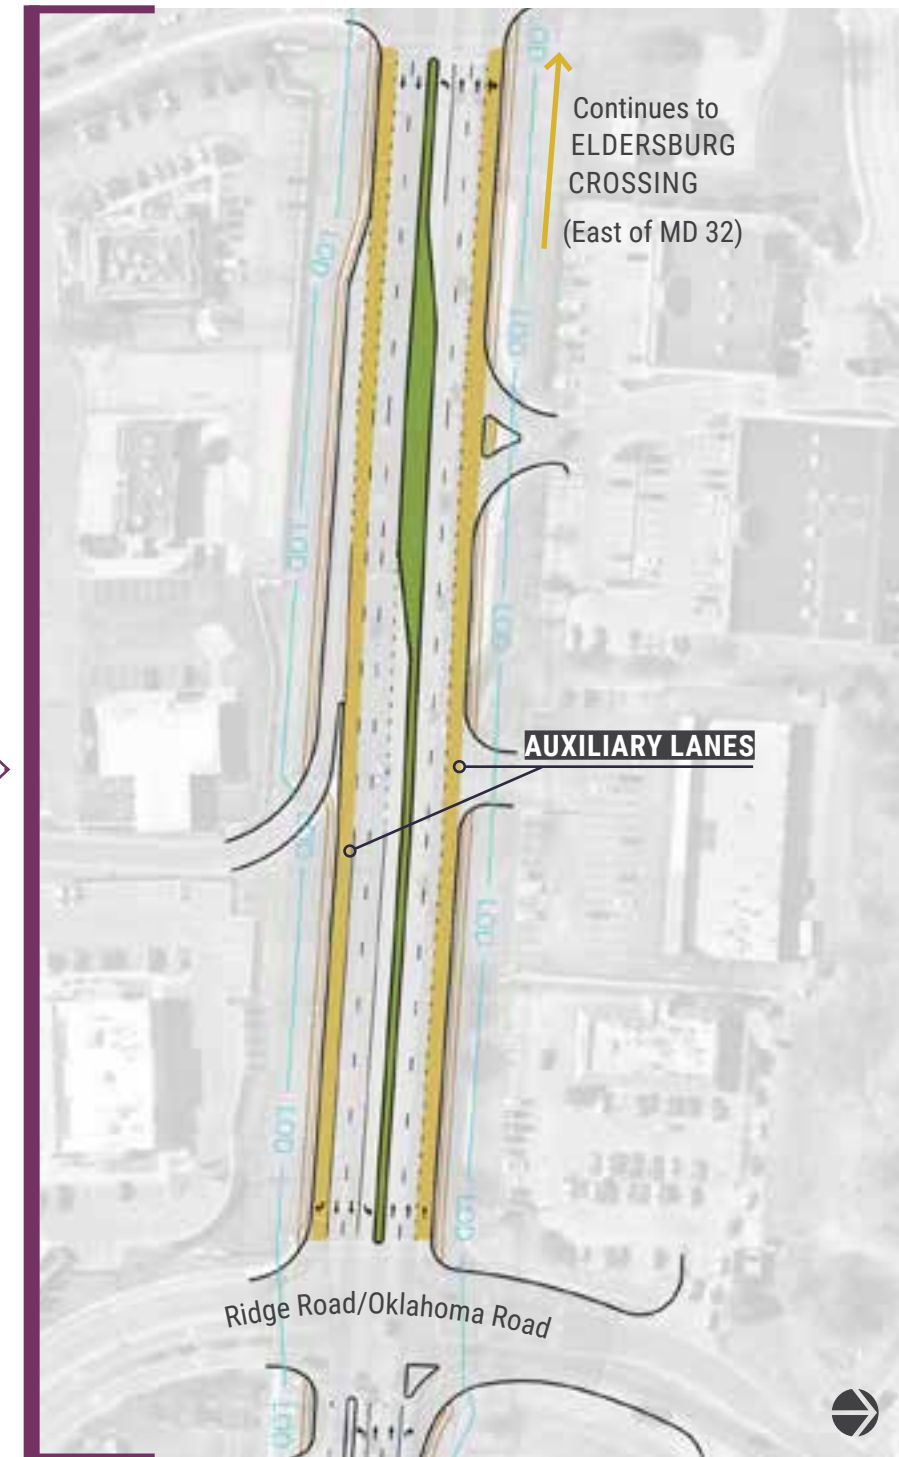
Detail of Auxiliary Lane Near Ridge Road/Oklahoma Road
